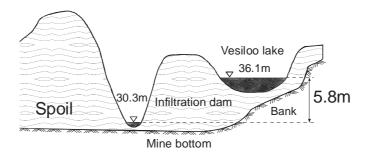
Cross-section of infiltration dam in the mined-out area of Viivikonna section. Water level in Lake Vesiloo has remained 6 m higher from water level in lower lake for 45 years
